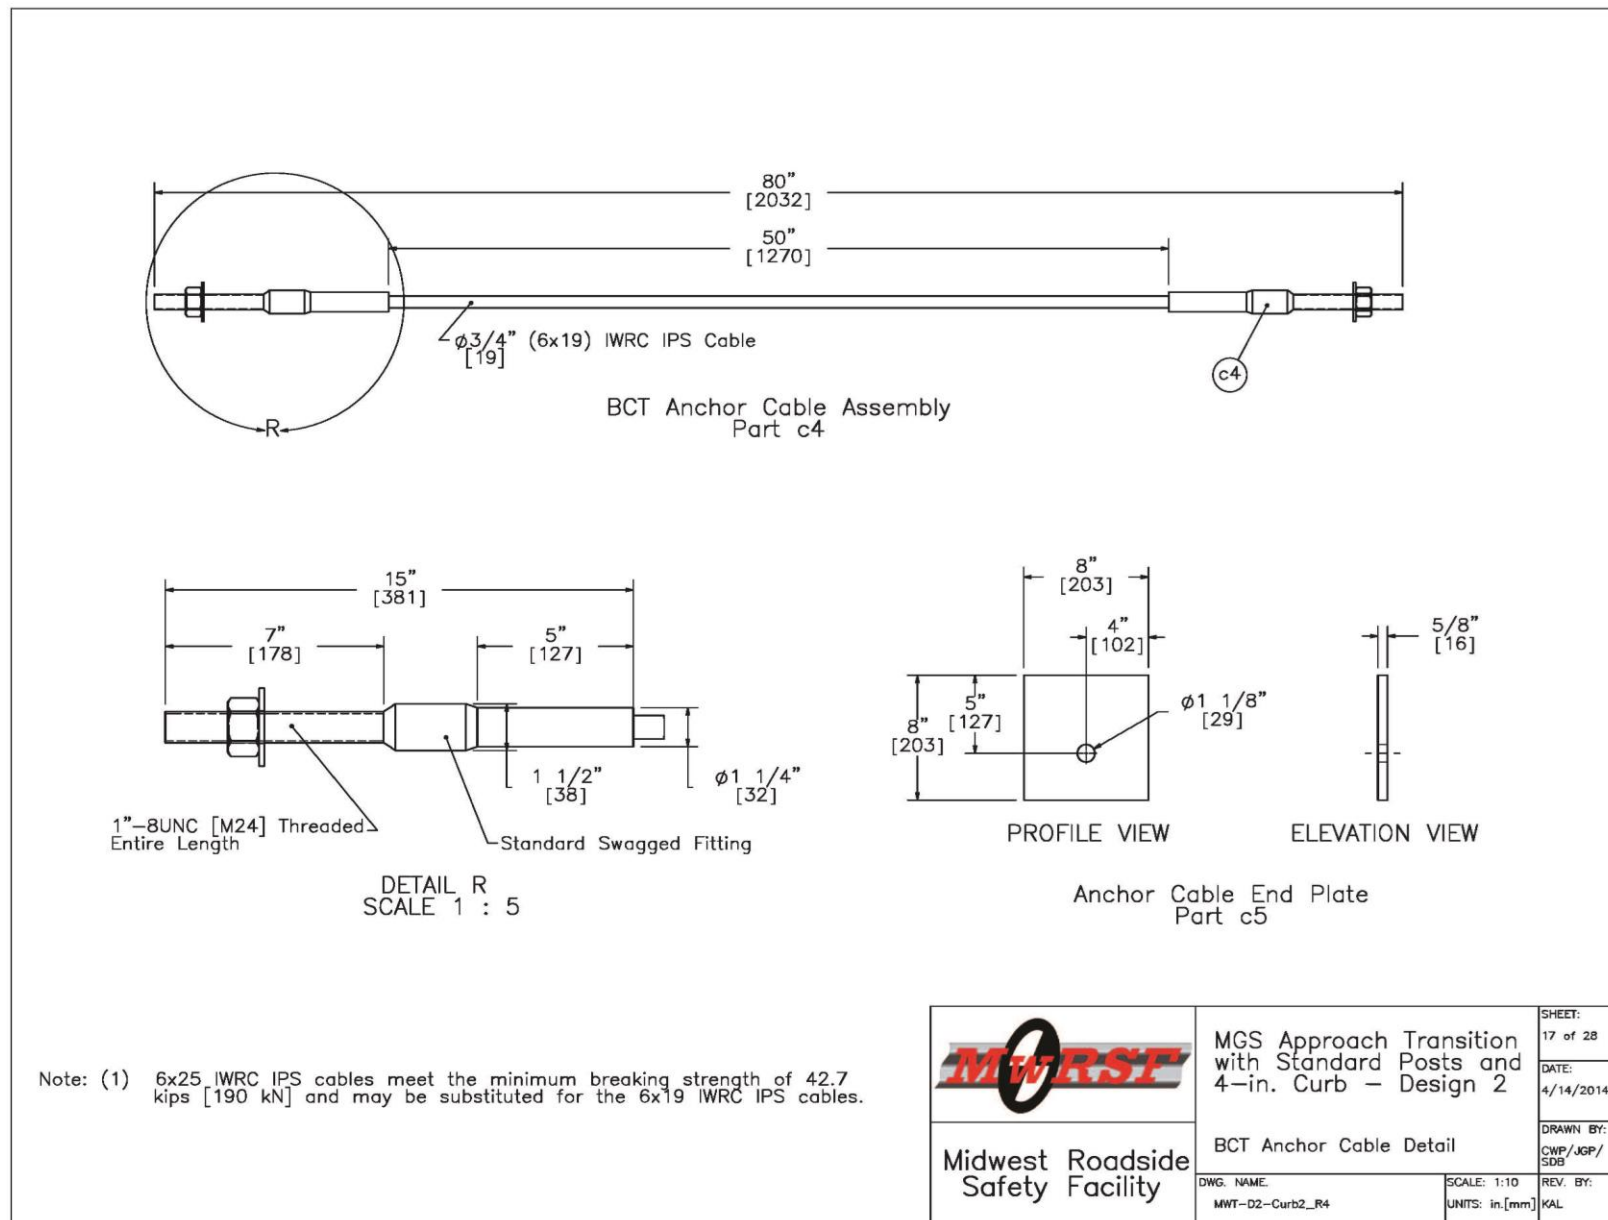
BCT Anchor Cable Detail, Test Nos. MWTC-2 and MWTC-3
